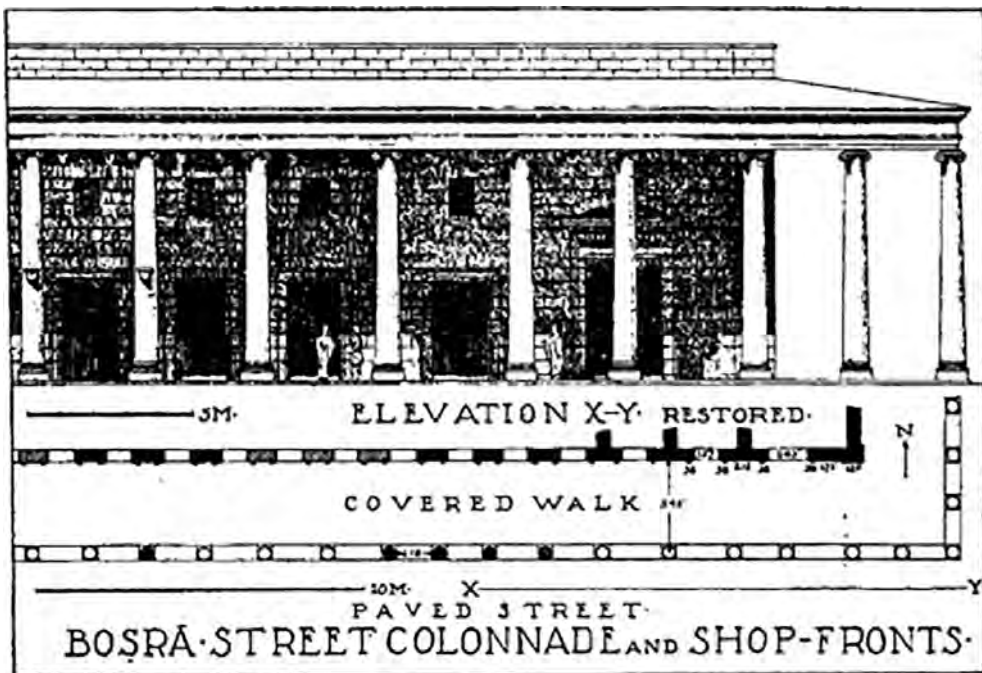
Reconstruction of a Bosra street colonnade, with the sidewalk roofed (After Butler)
